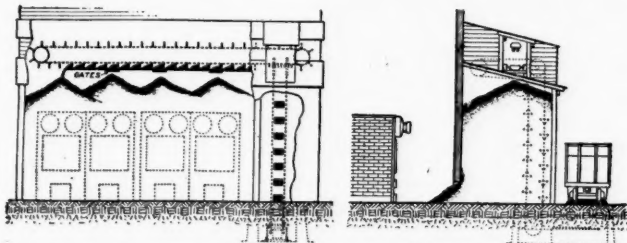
BUCKET ELEVATOR AND HORIZONTAL CONVEYOR TO DISTRIBUTE COAL
